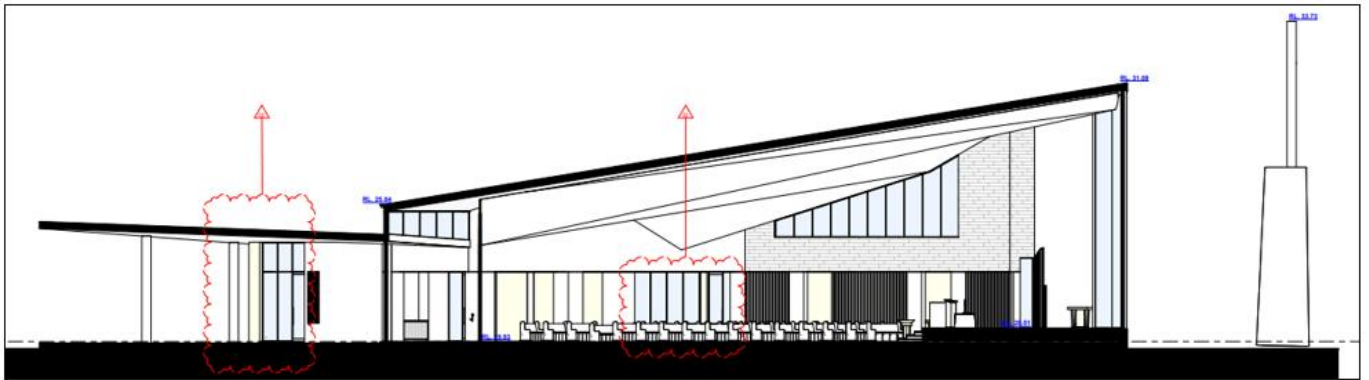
| Proposed changes to the church envelope illustrating addition of church offices (Source: Applicant’s RtS, 2026)
